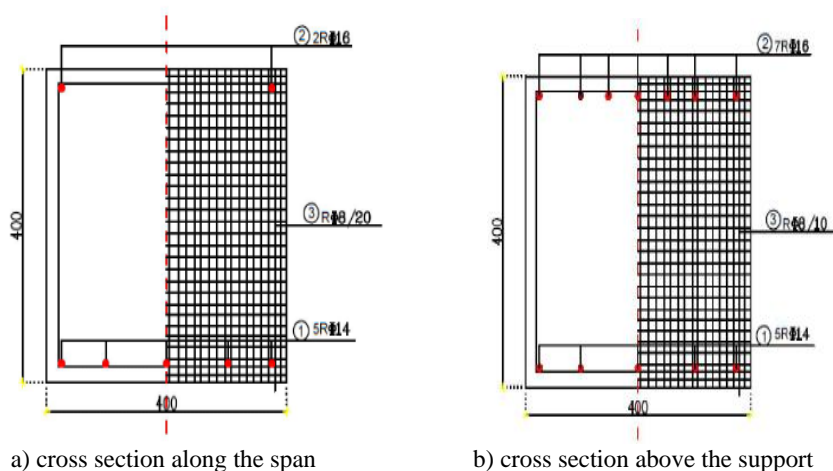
Cross section of continuous reinforced concrete beam in the middle of the span and above the support, for cross section 40x40 cm with cover thickness $a = 2.5$ cm
